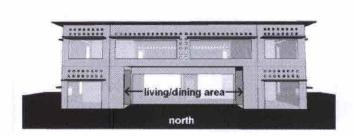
A detached house (under construction) in the Bangi, Malaysia endeavours to achieve Passive Architecture goals via wide openings facing north.
